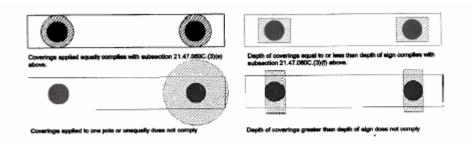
Examples of pole wrap. Poles depicted in plan view.
